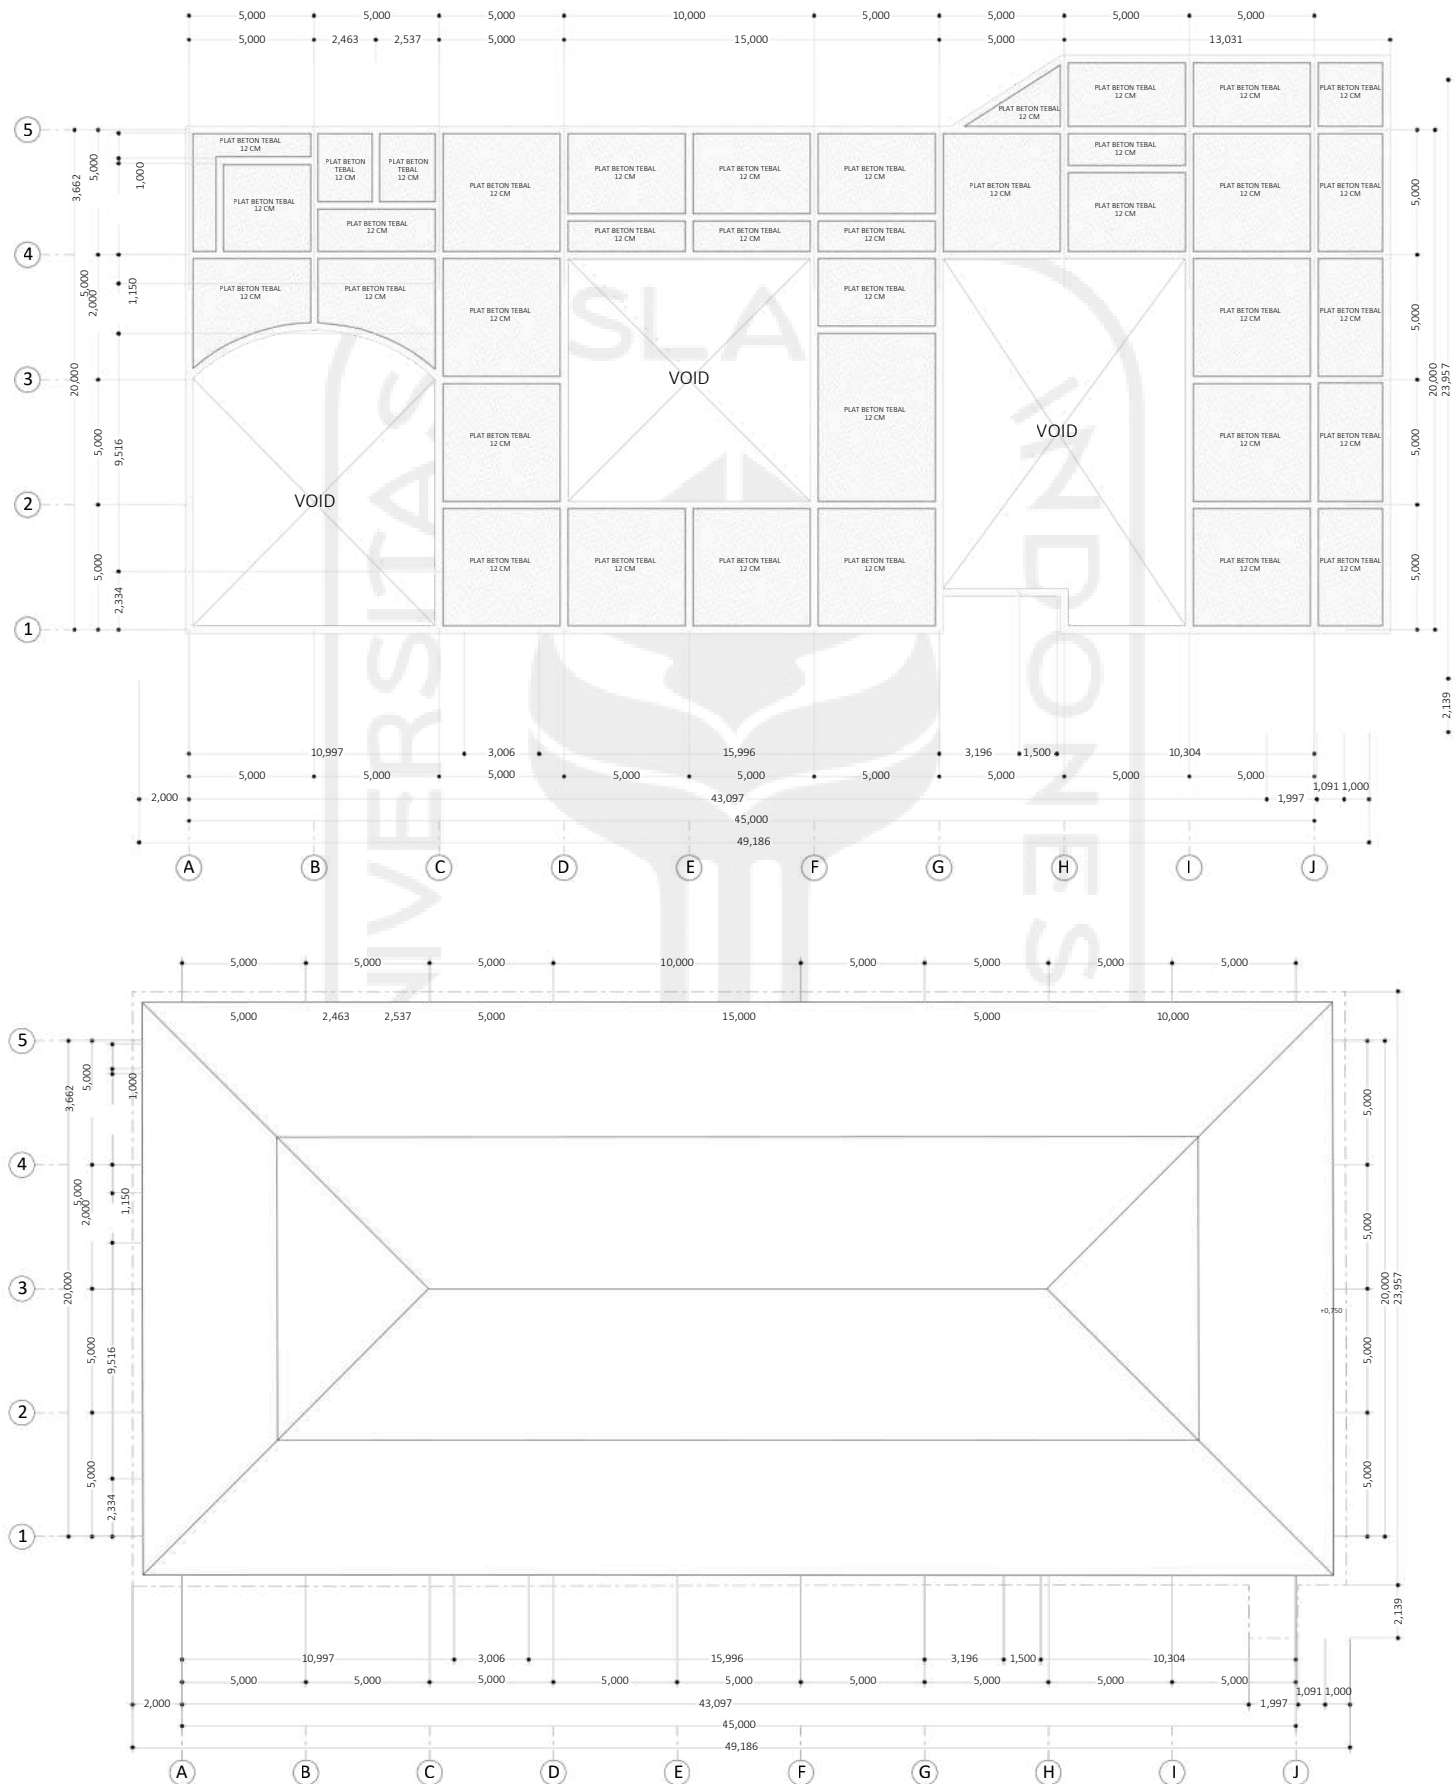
# DETAIL FLOOR PLATE 2ND FLOORS (BUILDING A1)
